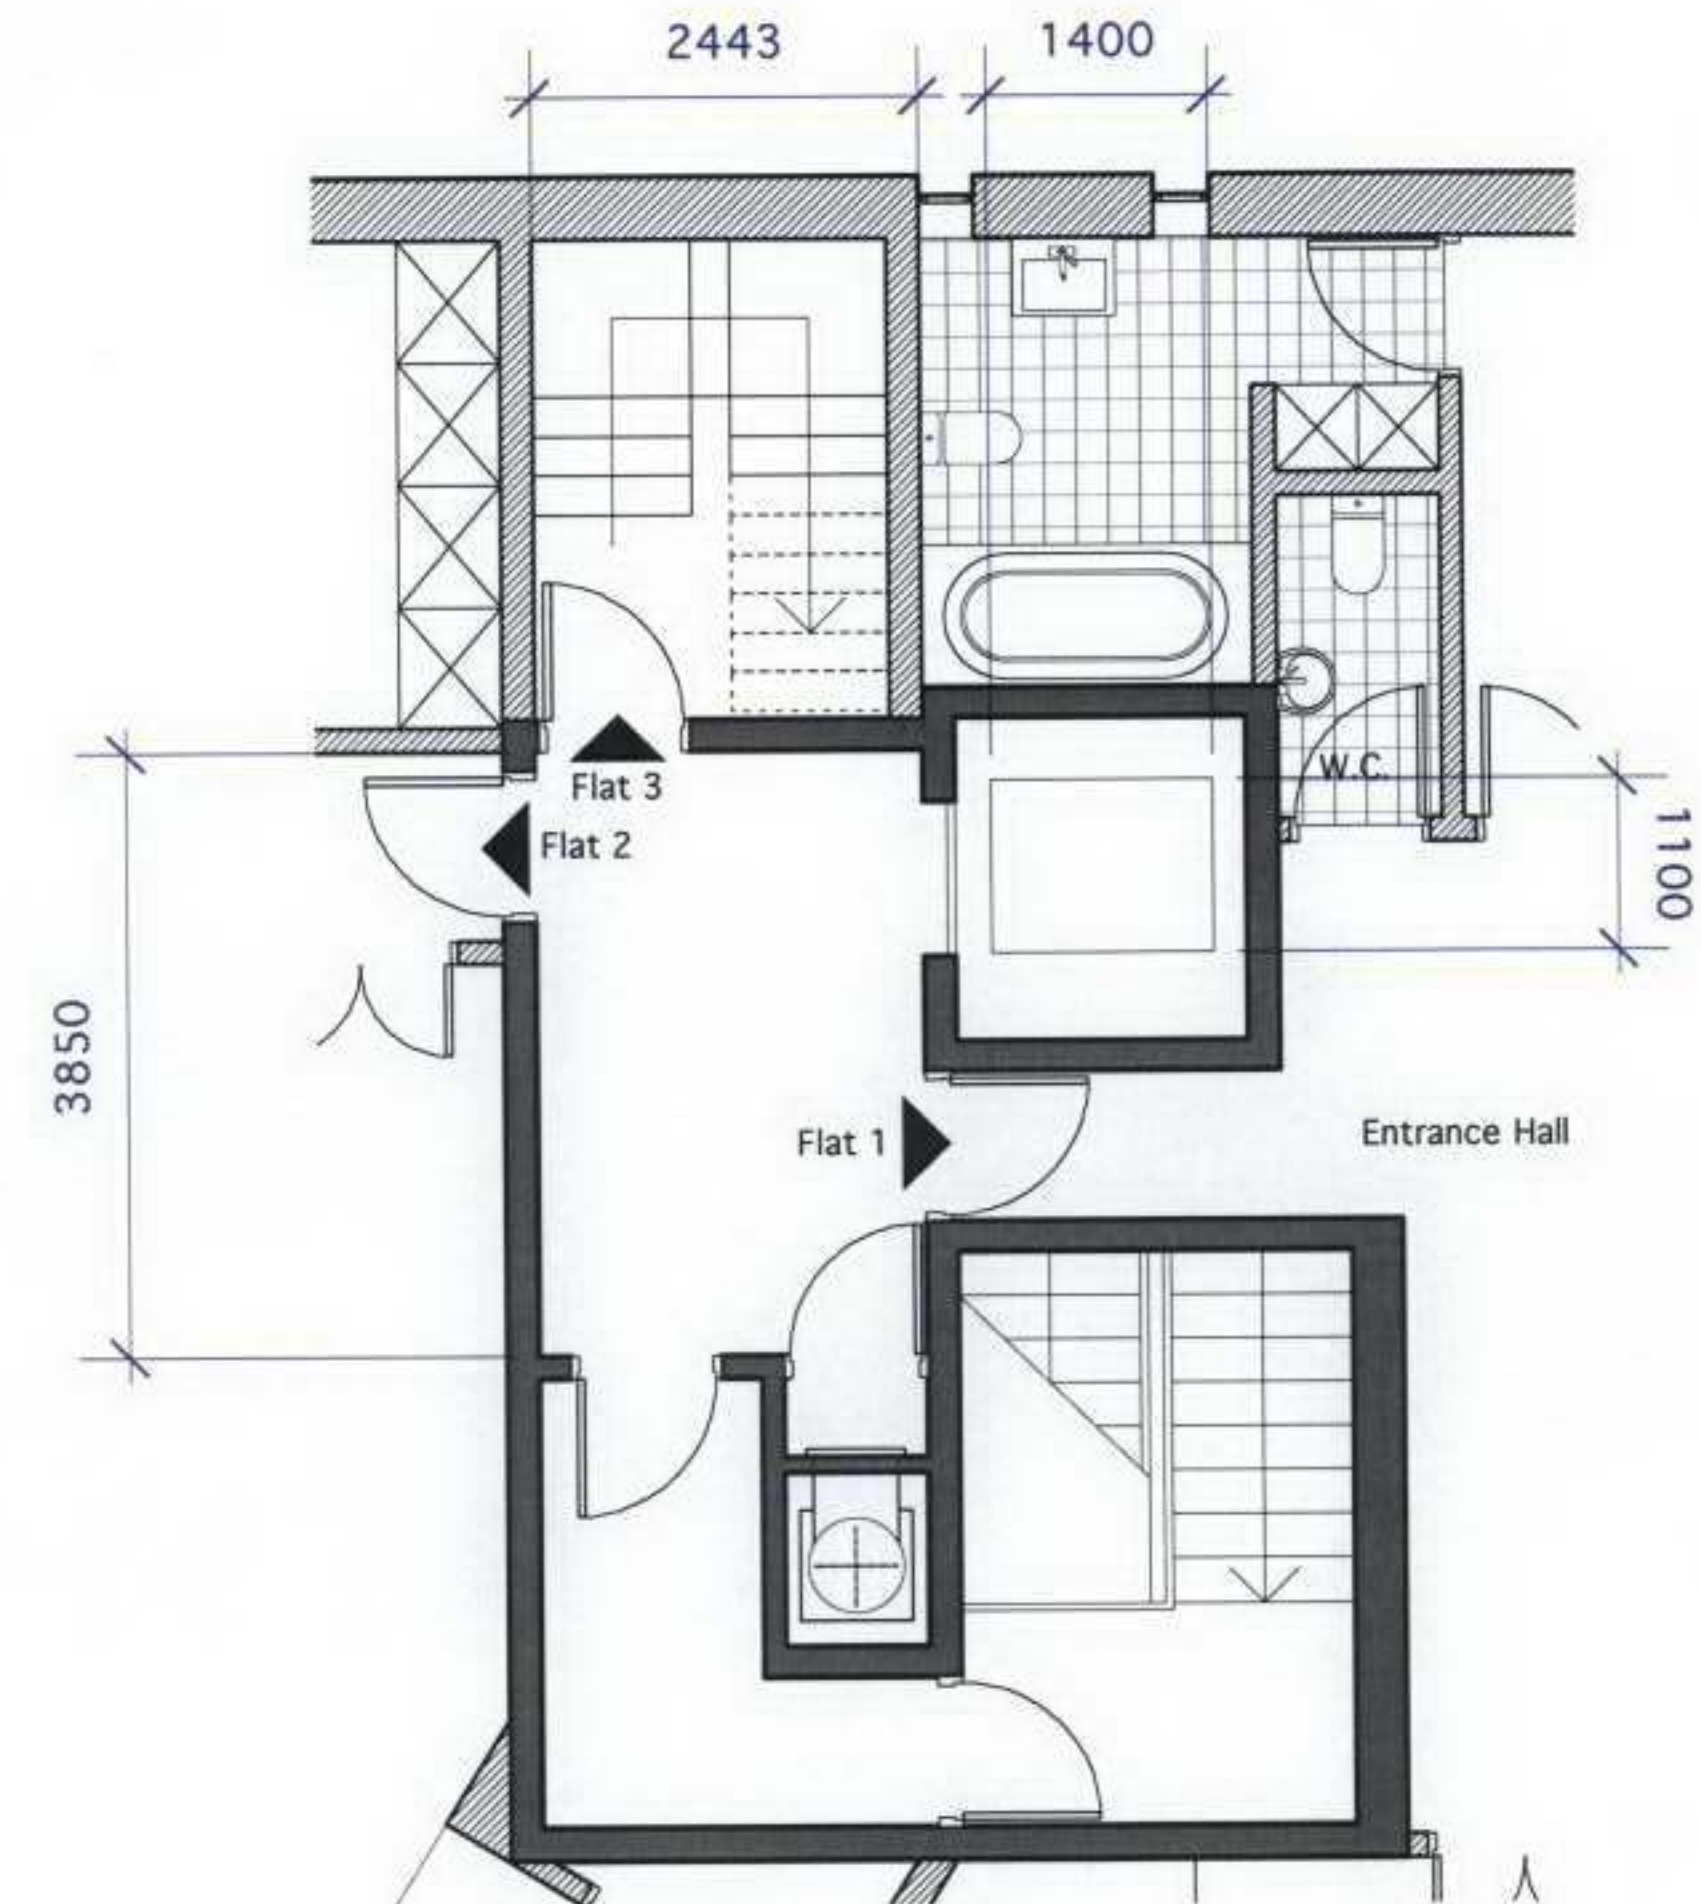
Plan detail of the fourth floor of the new proposal showing the dimensions of the lift landing and lift car.
